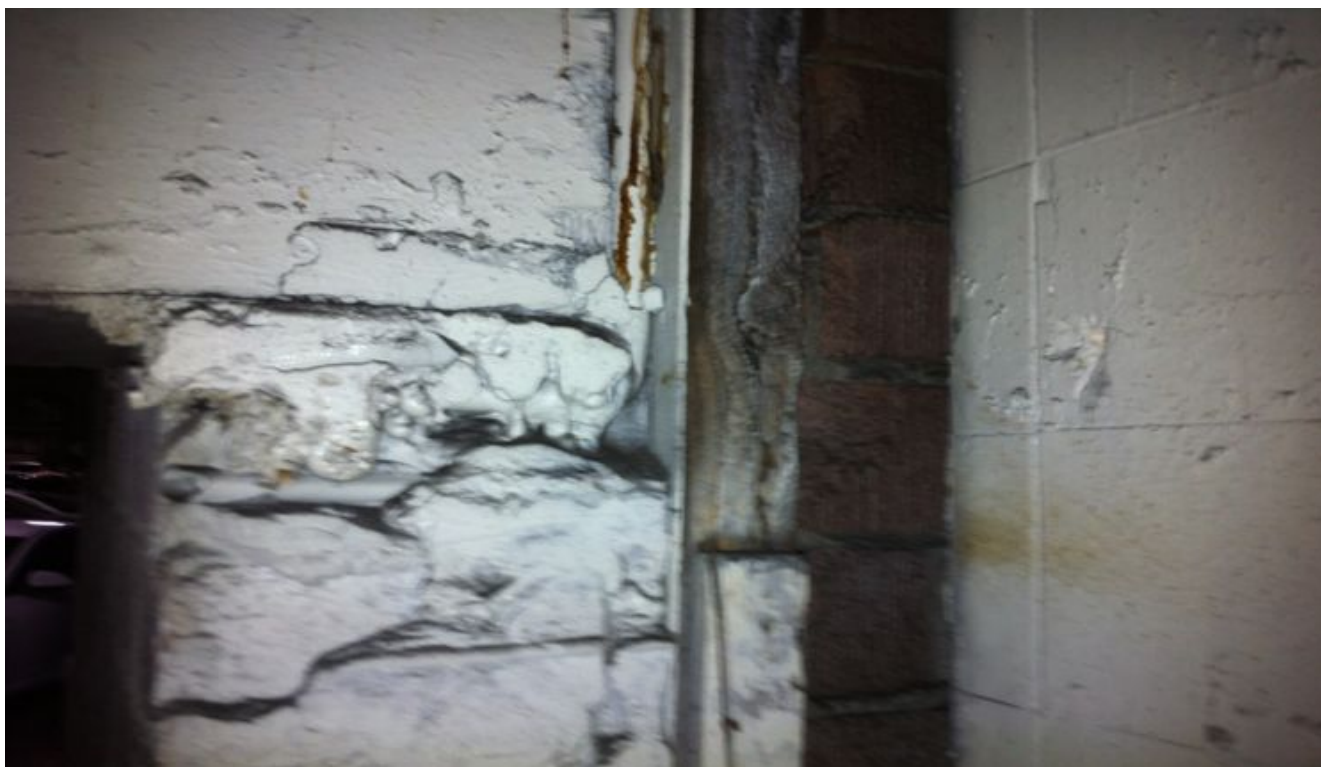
Asbestos cement sheeting on the old wall cladding to the Basement Level Tunnel 1 within Wynyard Lane Car Park.
